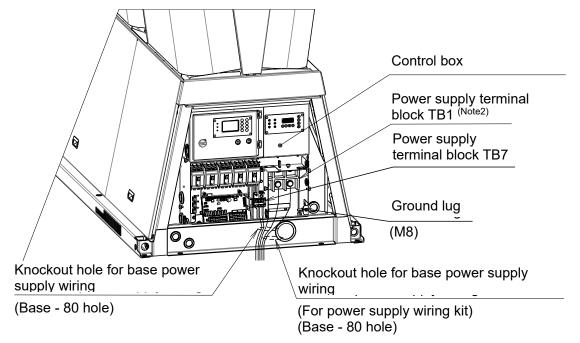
Figure A - Power supply wiring example (using the right hand side power supply cable access)
